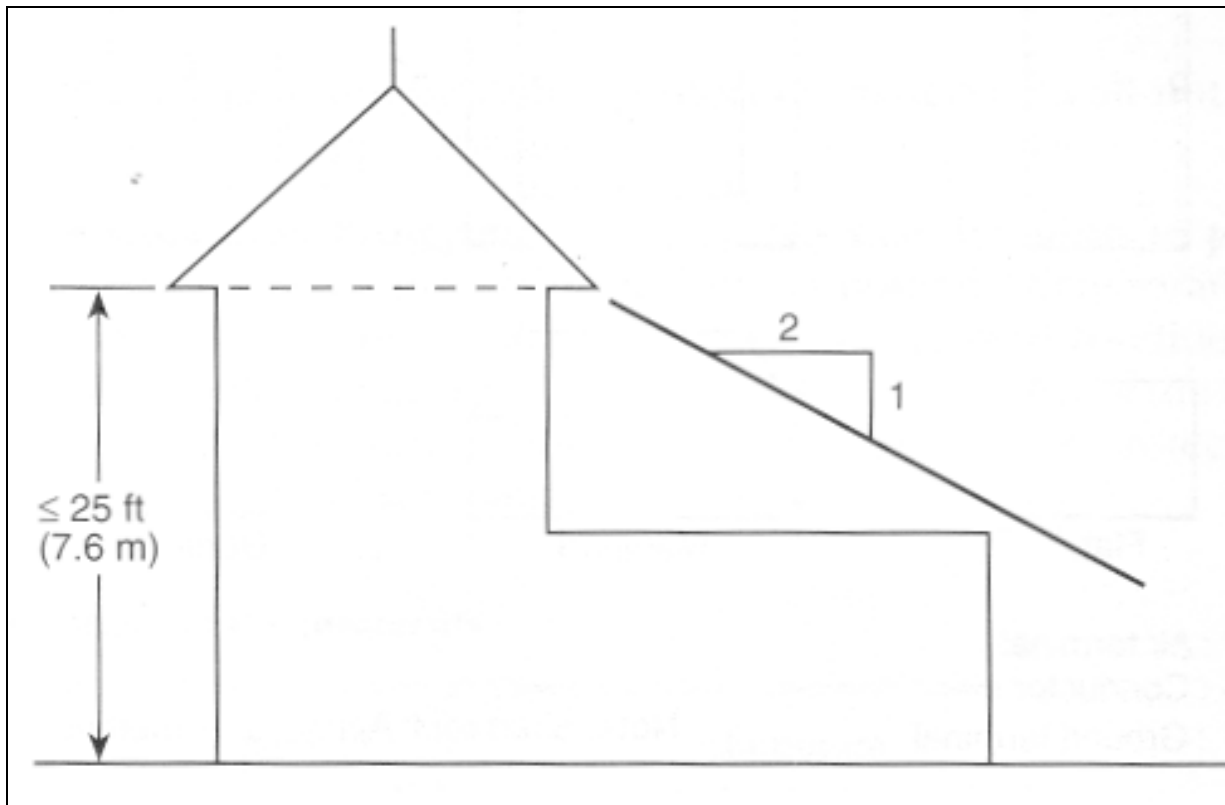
Lower roof protection provided by pitched roof 25-feet or less high
